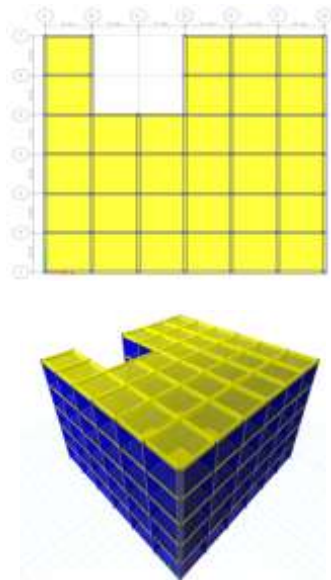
Discontinuity at the outer edge of opposite side of the building(M4)
